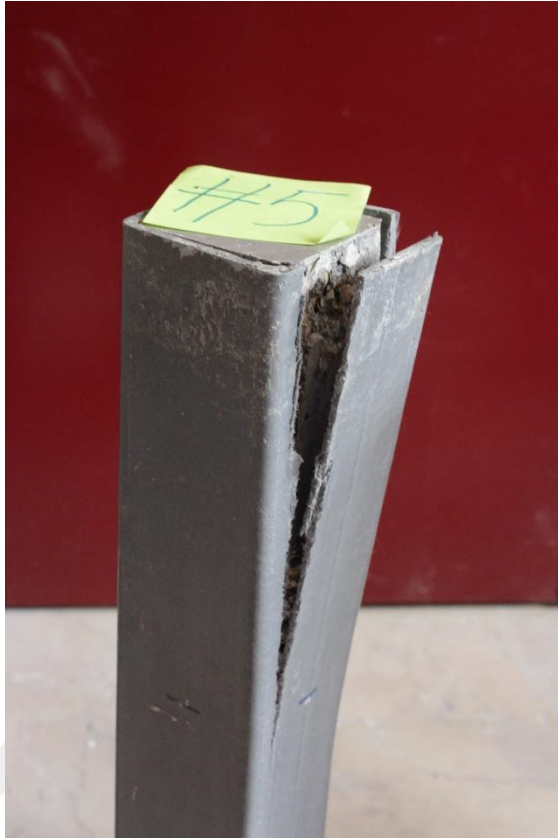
GRP tube (GC-SCC-G3-0%-W) after test
